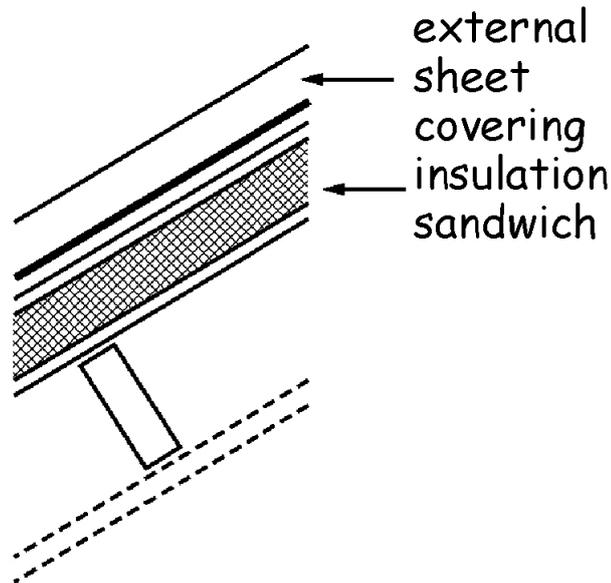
Roof constructions - Type C (slate or tiles - insulation on decking)
